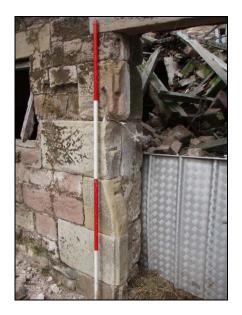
Carved sandstone jamb of ground floor door in the south-west elevation of the barn
